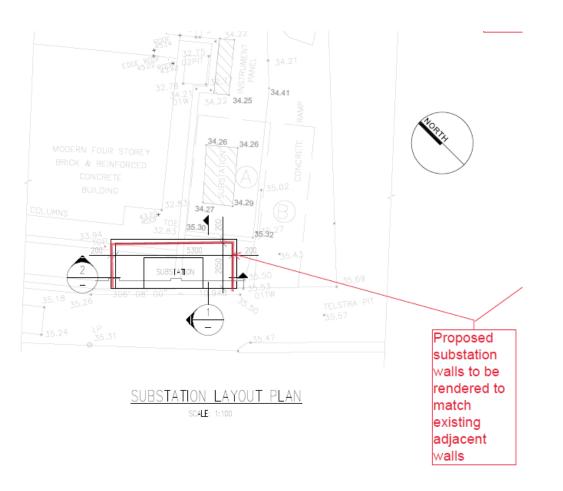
Plan of the proposed substation and new walls to the rear and sides. J-Block is labelled 'modern 4 storey building'. (Source: Excerpt from drawing titled '85 Carabella Street Kirribilli Substation Plan Elevation and Section', Sheet 01 revision A, prepared by Michael Ell Consulting Engineers Pty Ltd, dated 11 October 2019)
